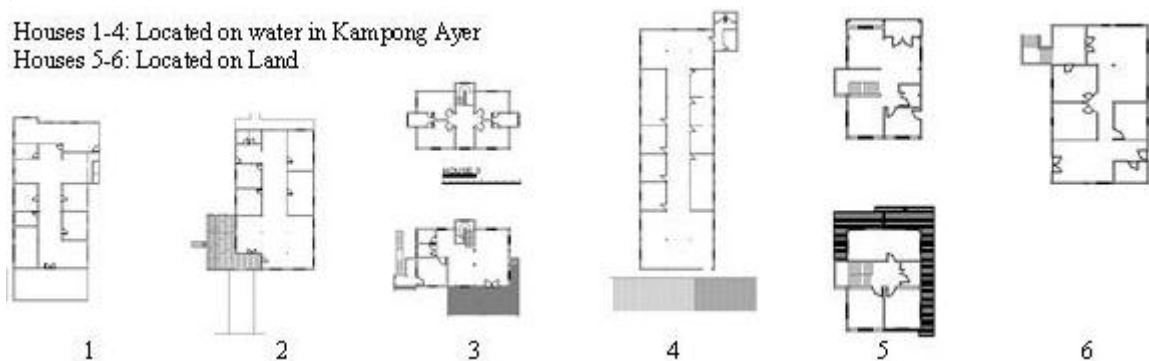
House plans of six houses (Source: House 1, 2, 4 & 6 from authors; House 3 & 5 from Public Works Department and Housing Development Department, Brunei Darussalam, respectively).
